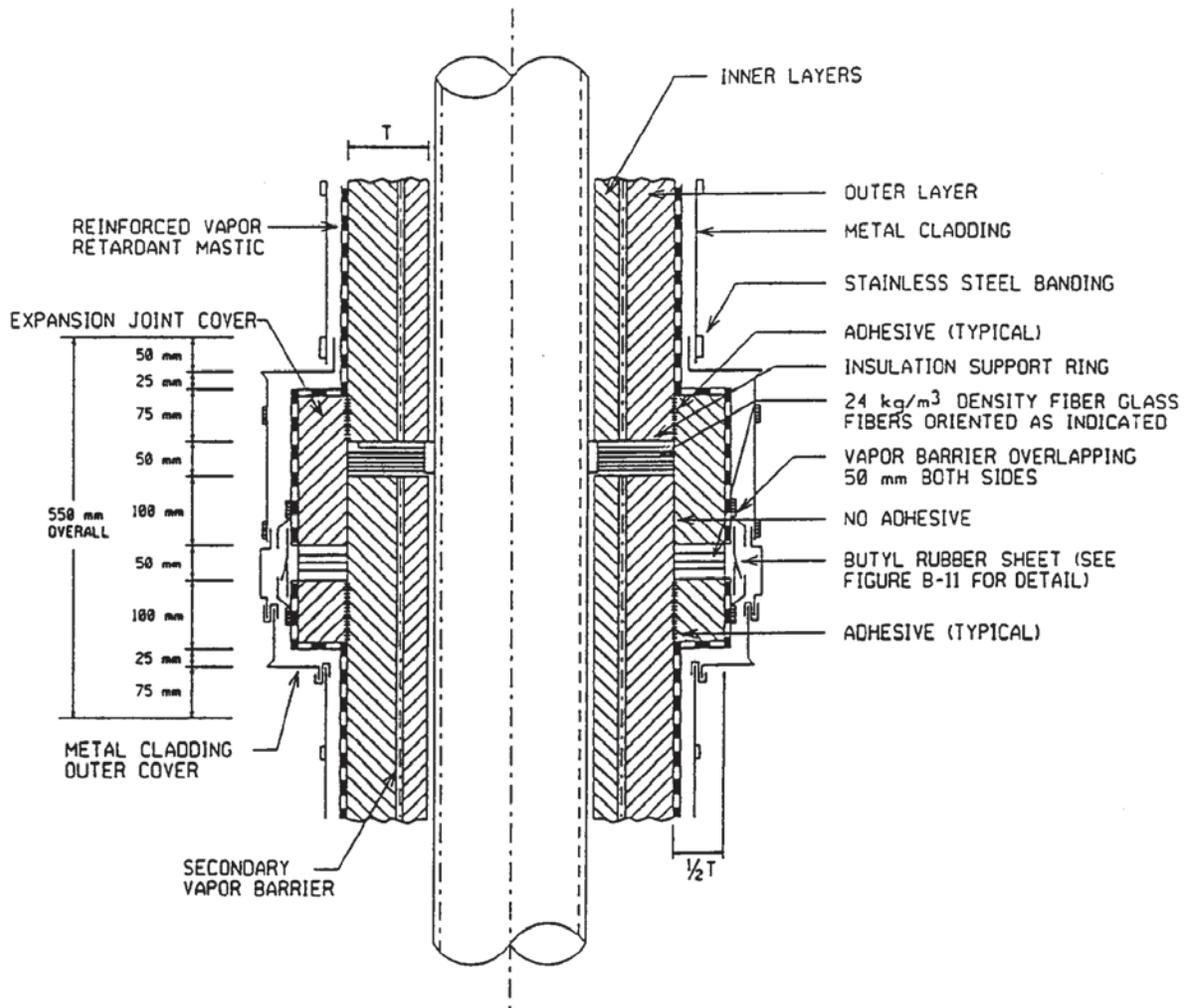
Arrangement of Expansion/Contraction Joint at Insulation Support Rings on Vertical Equipment and Piping for Cold Service
